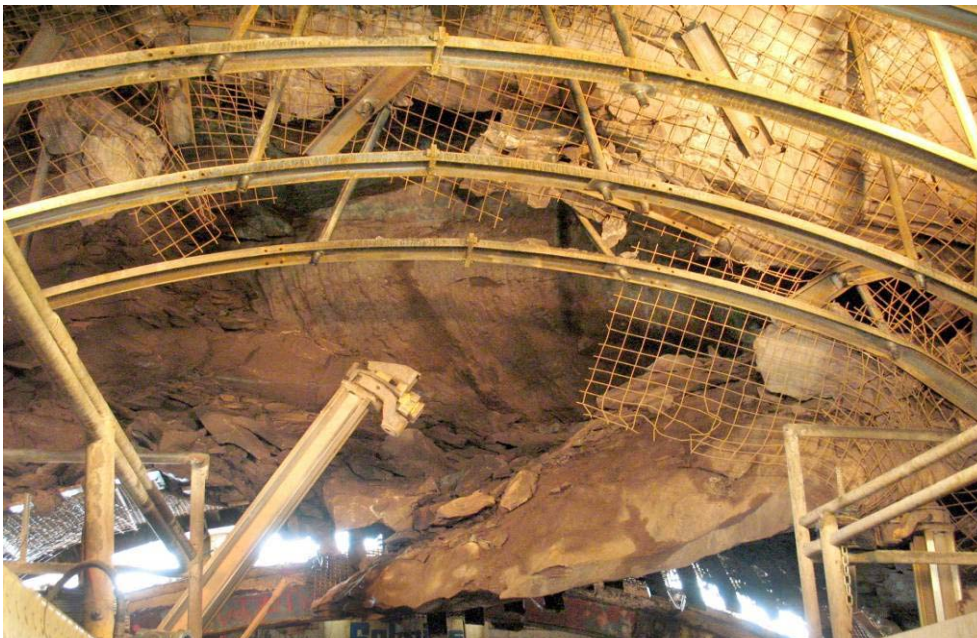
Roof wedge at the Niagara Tunnel Project, showing the block hung up on drilling equipment with wedge detachment in front of the rock support installation area (Perras, 2009).
